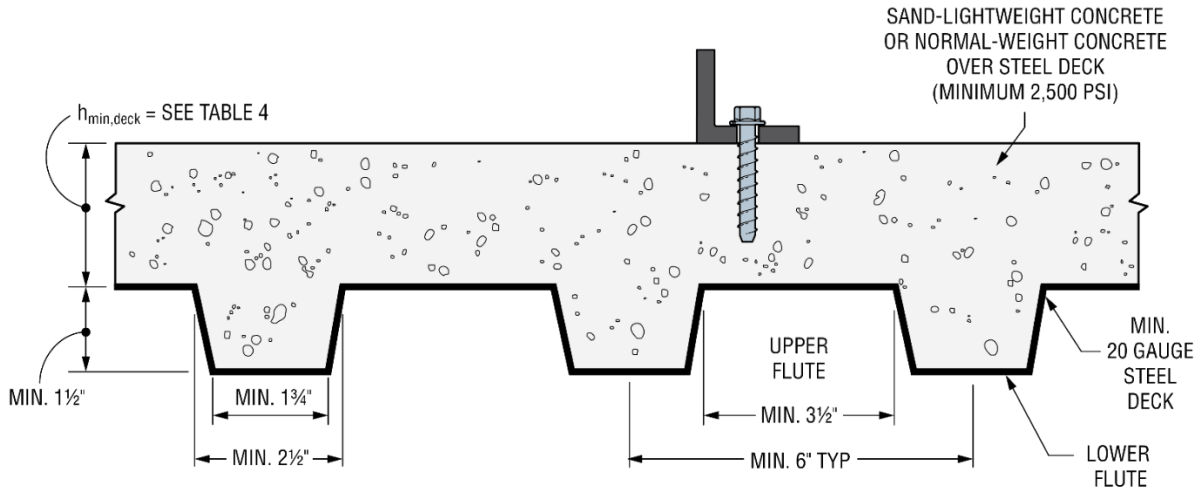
INSTALLATION OF 1/4-INCH, 3/8-INCH AND 1/2-INCH SHANK DIAMETER SCREW ANCHORS IN THE TOPSIDE OF CONCRETE-FILLED PROFILE STEEL DECK FLOOR AND ROOF ASSEMBLIES (1 in = 25.4 mm)
